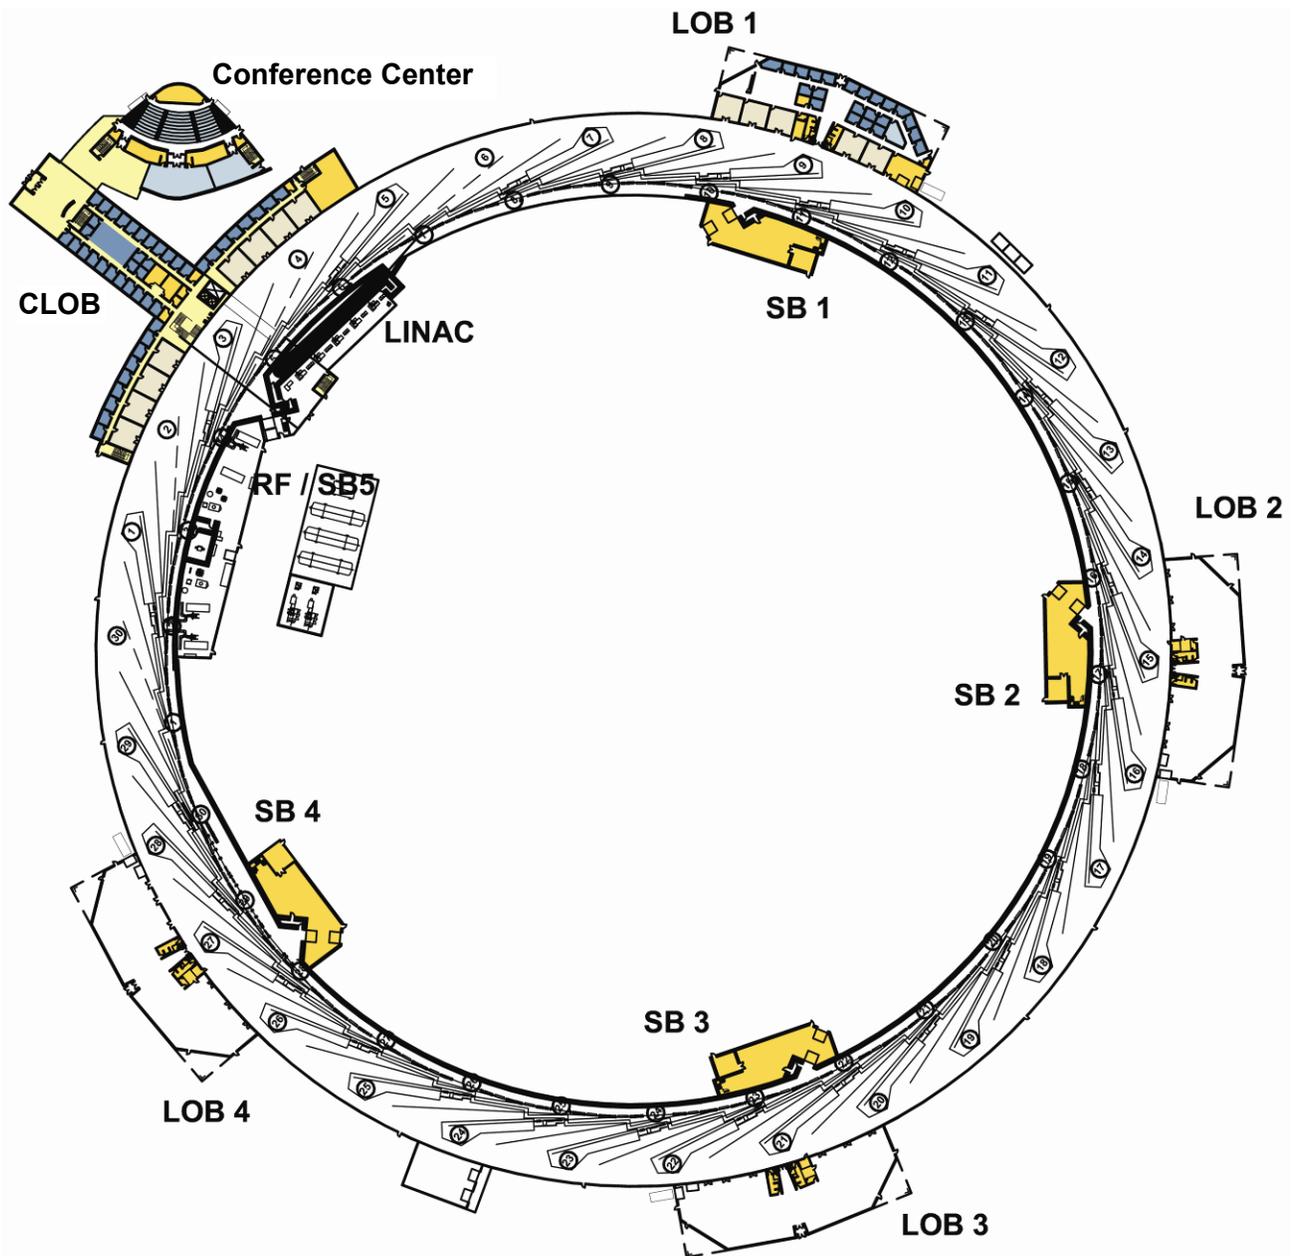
NSLS-II Complex Layout – First Floor Plan, base scope.
